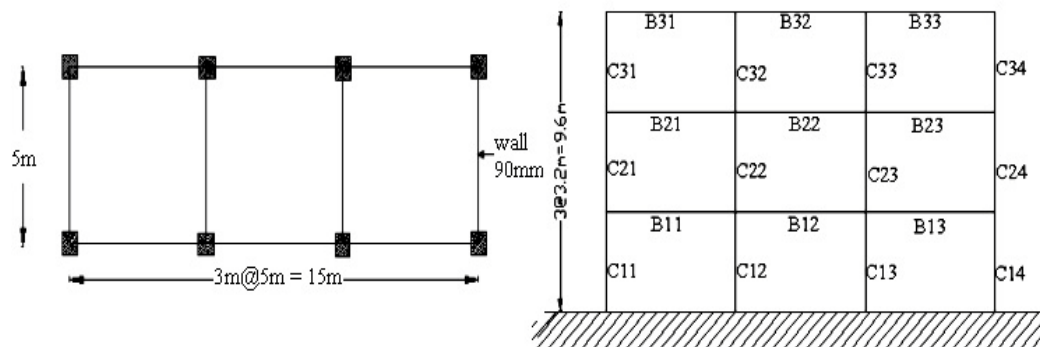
Plan and elevation of B3Z5 and B3Z3
